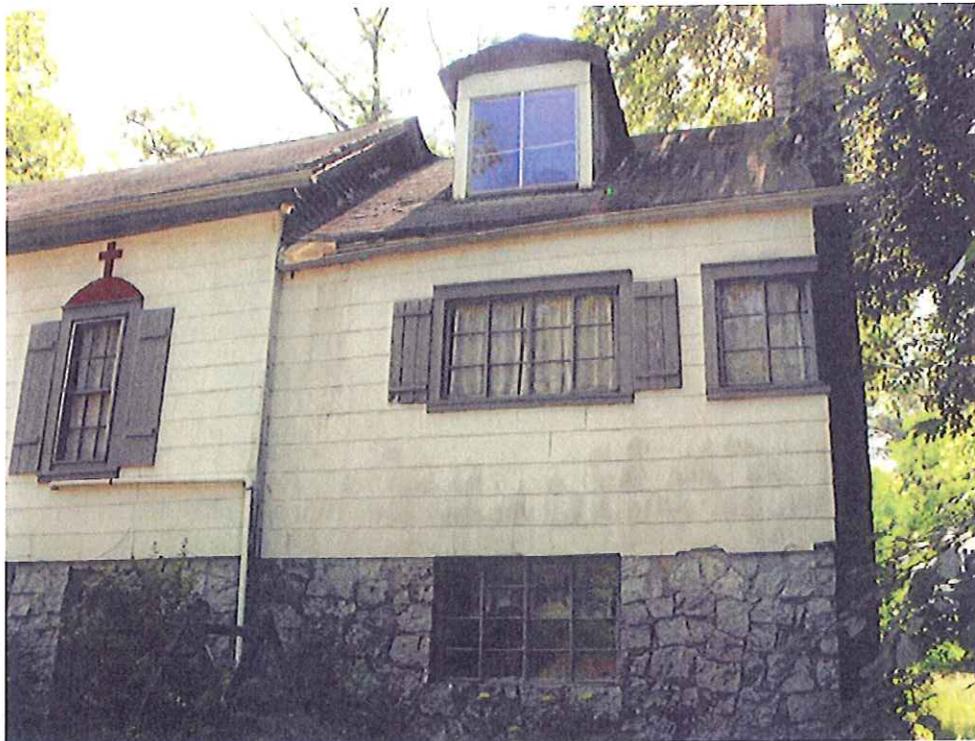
Detail of Joining of the Original House to Historic Rear Addition, Facing East
